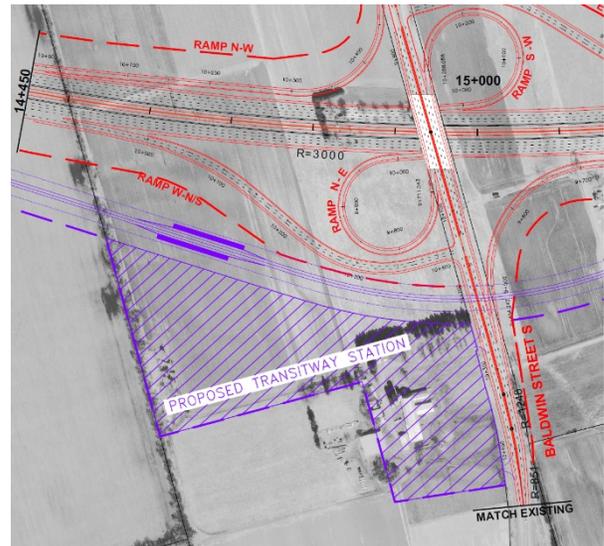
Excerpt of preliminary design drawing showing the proposed 407 Transitway station at Baldwin Street (Source: 407 East Individual Environmental Assessment and Preliminary Design Study, 2009, Appendix D—Recommended Design Plates)
